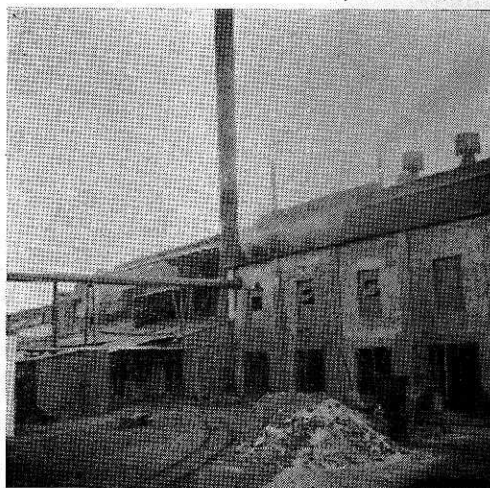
A VIEW OF THE POWER HOUSE AND SMELTER BUILDING
